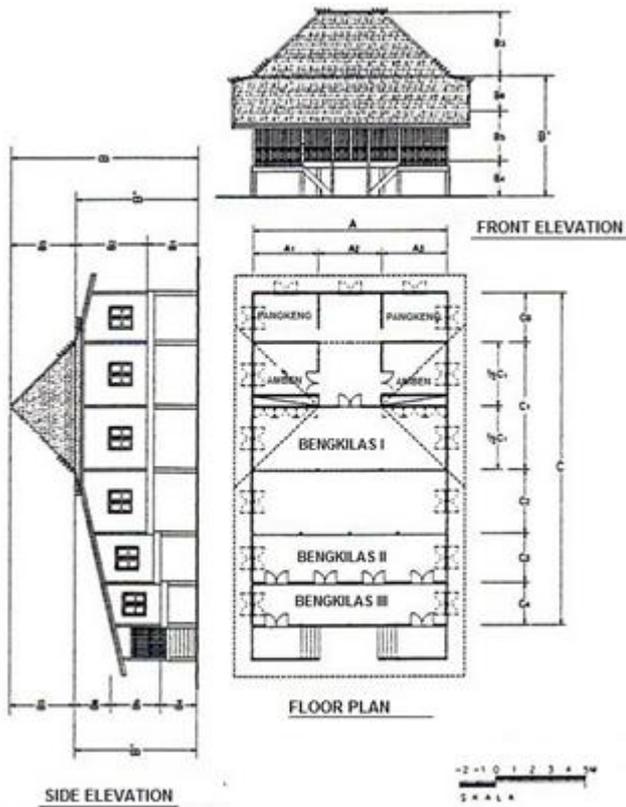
Limas House Three Bengkilas Plan and The Instructions for Measurement
